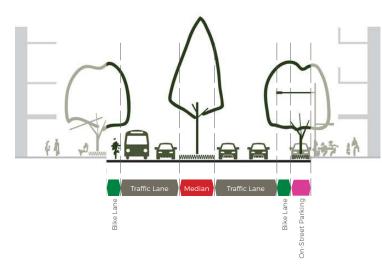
Streetscape Typical Cross Section for reference- CARRIAGEWAY
